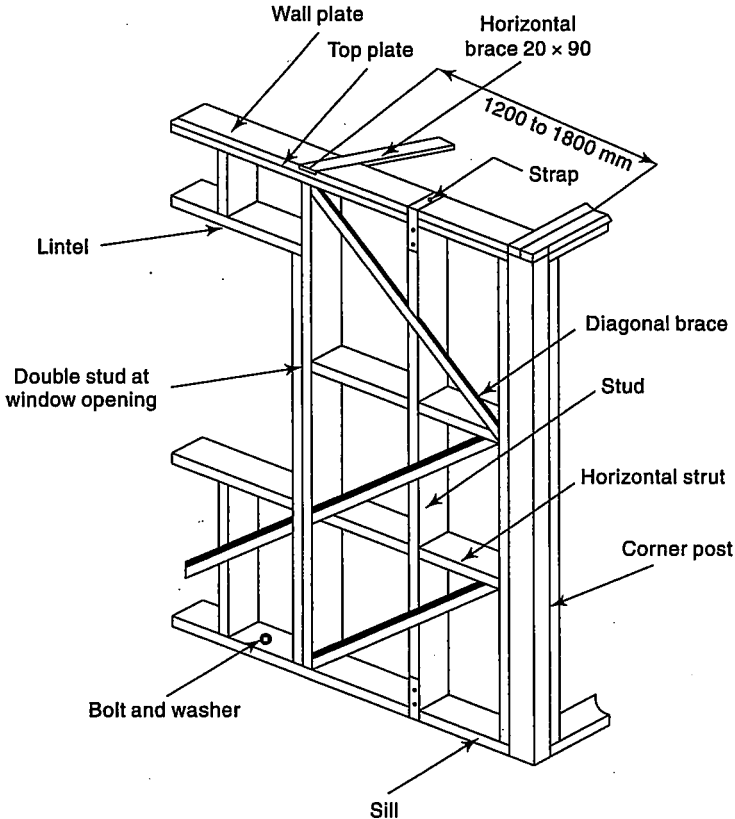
Timber framing in stud wall construction with opening in wall
